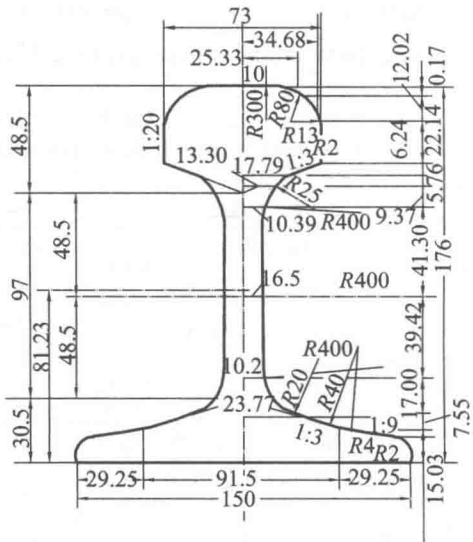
Profiles of UIC 60 rail head (units: mm)
